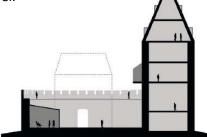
A cross section of the castle. Source:(Gemeente Teylingen, 2015)
